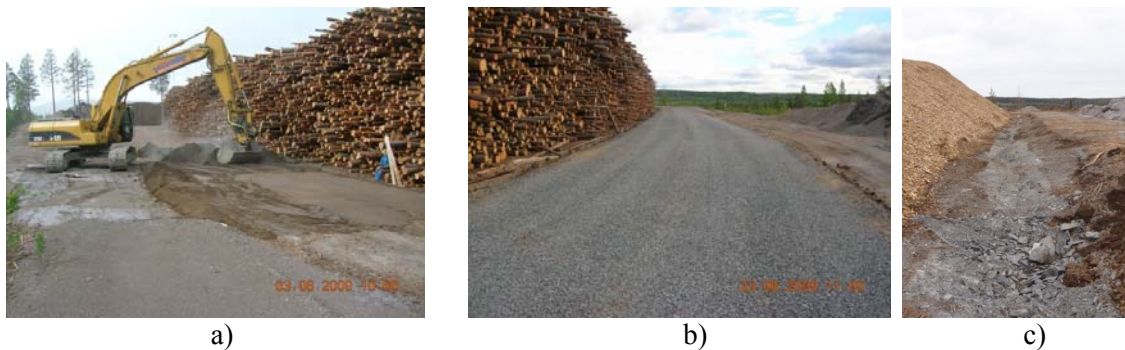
a) Lungviksverket, the construction of the road section with fly ash, b) the finished road construction and c) installed road ditch. (Photo: Daniel Ivarsson, Jämtkraft).
